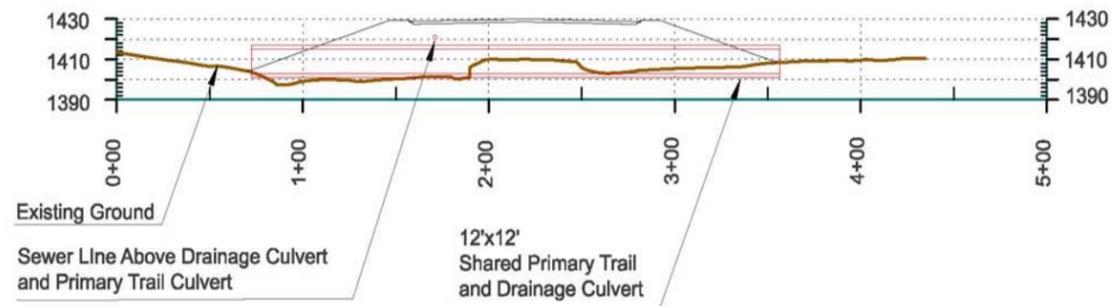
Alternative 3: Shared Drainage Culvert and Primary (Profile View)
